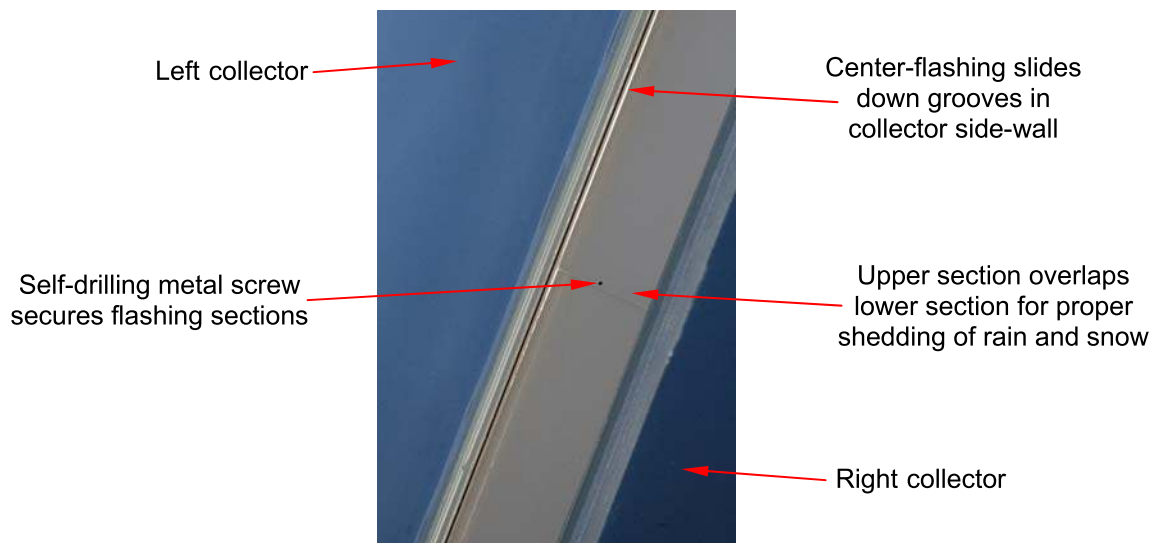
Center-flashing slides between collectors (2-, 3- and 4-collector appliances).
